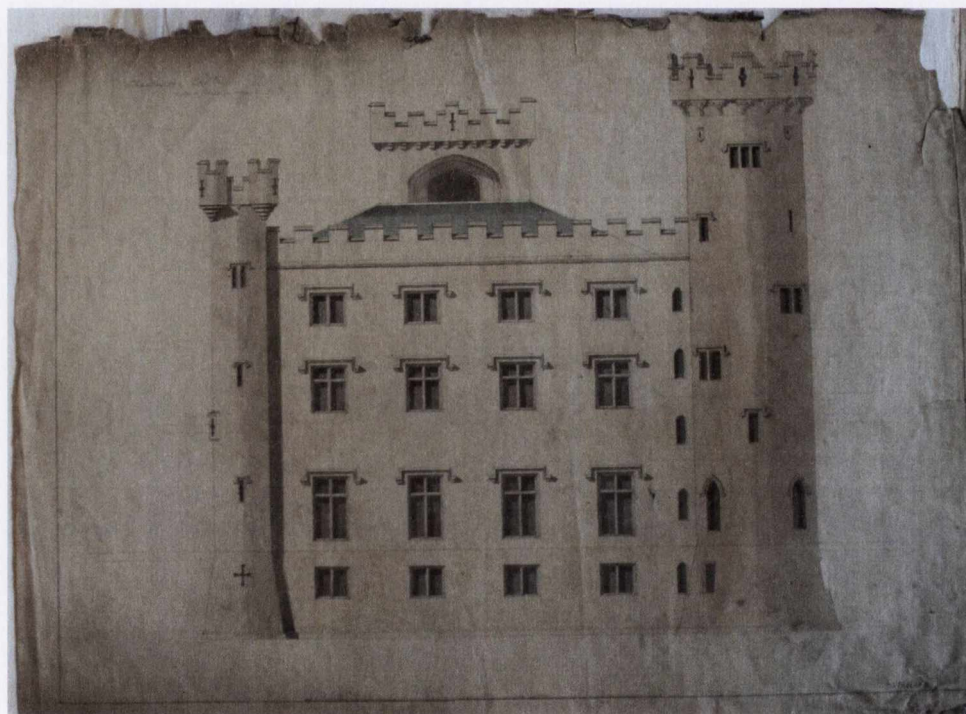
Charleville Castle, proposed elevation of east façade, Francis Johnston [1801], IAA, RIAI Murray Collection, 92/46.198, courtesy of the Irish Architectural Archive.
